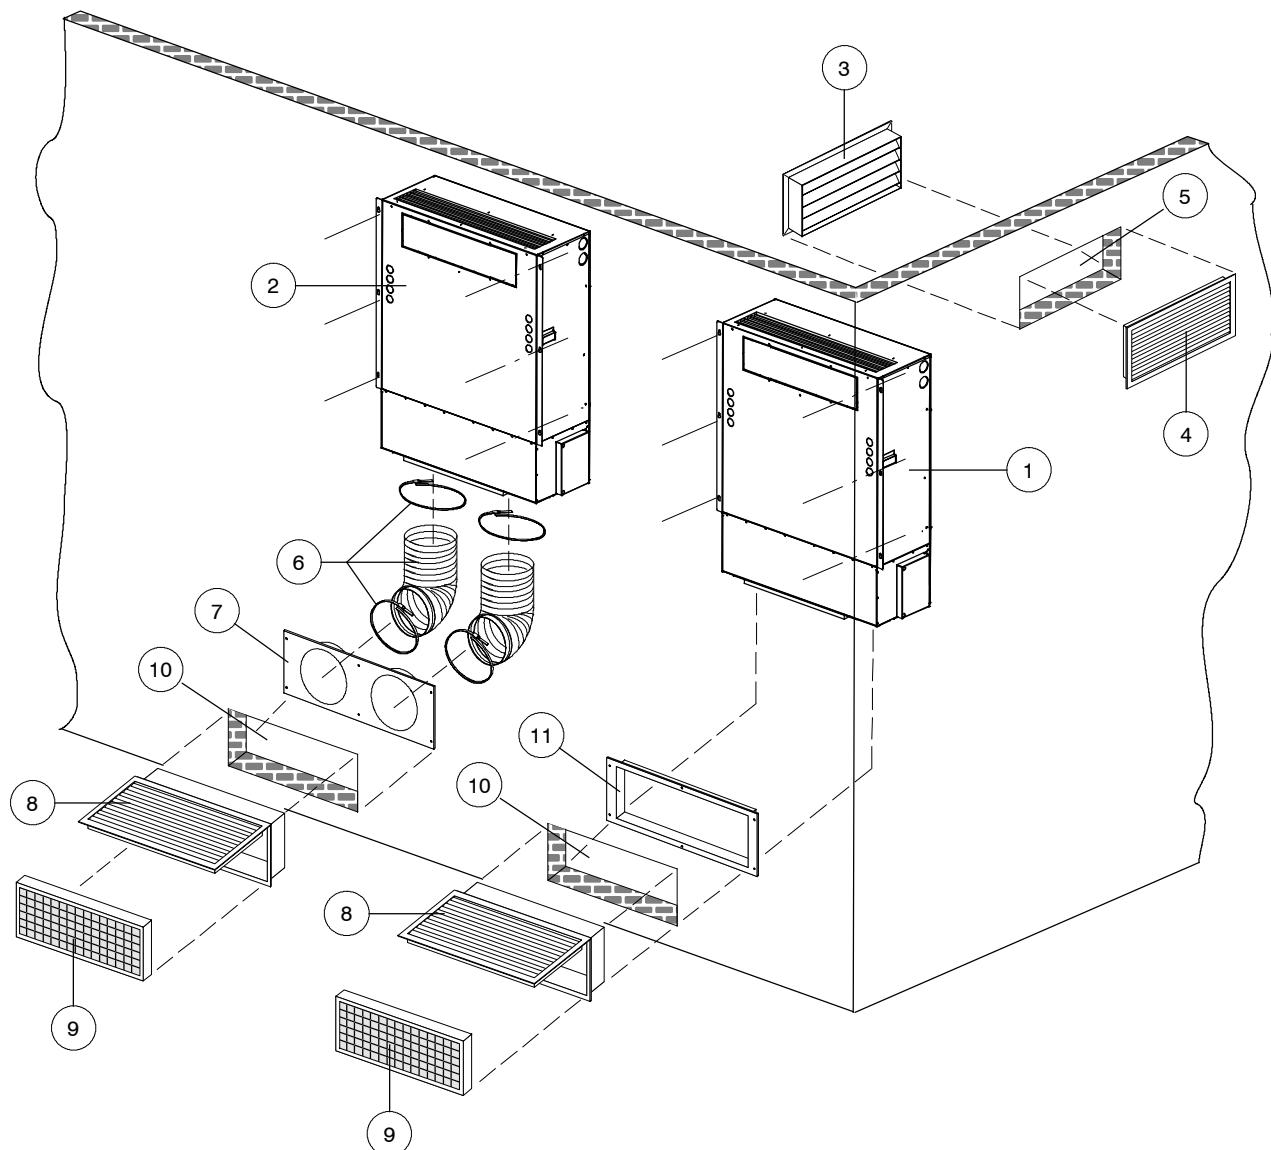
SE 06–08–10–13–14W evaporating unit wall installation
